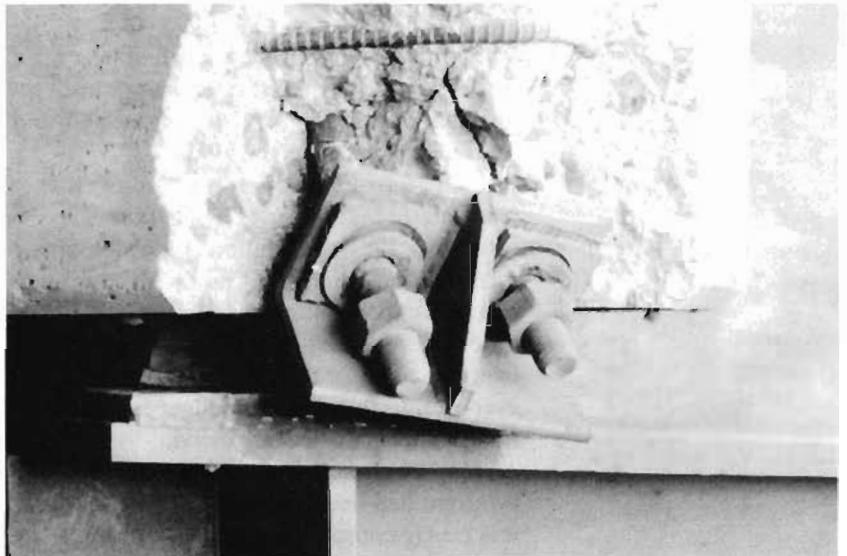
Although the Whitewater Overcrossing had been retrofitted with cable restrainers at the abutments, an improperly connected cable caused the restrainer at one abutment to fail during the 1985 Palm Springs earthquake. This permitted a movement of several inches to occur, which damaged the abutment seat support.
